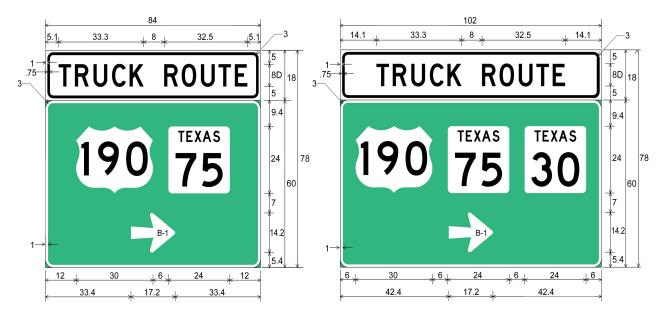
Large Advanced Truck Route Sign Assembly sign details
